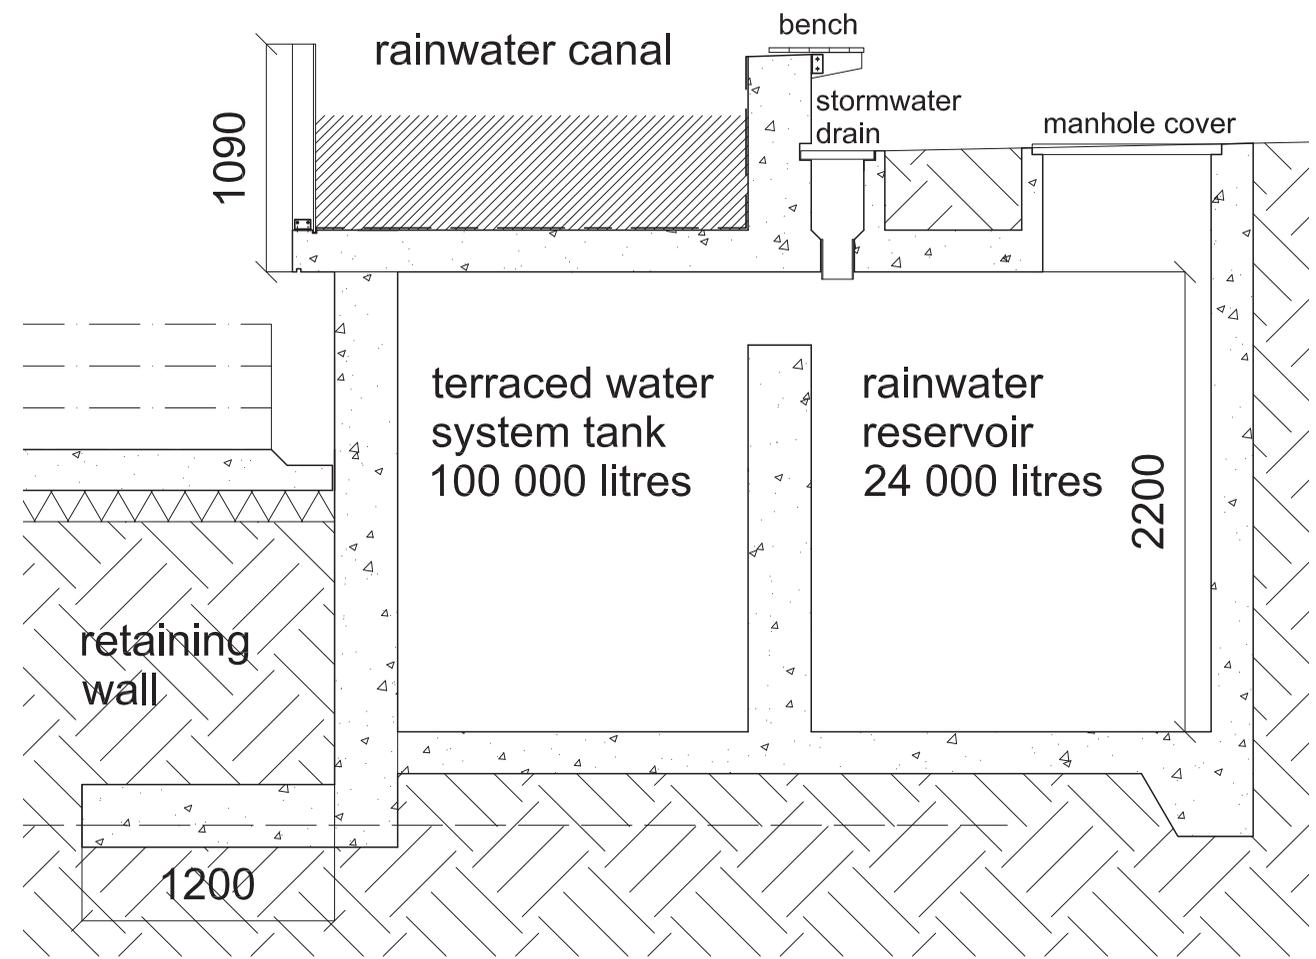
Detail section through water tanks. Scale 1:100. Author, May 2013.
